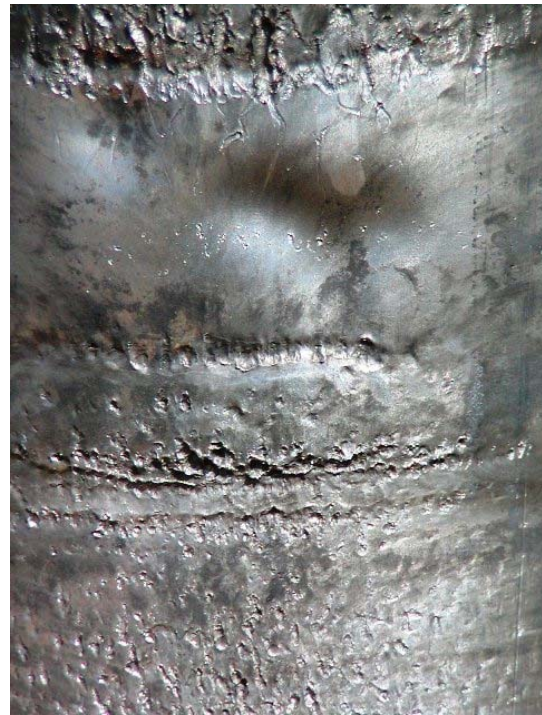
Column Surface of Column B1-C6 after Test 4
